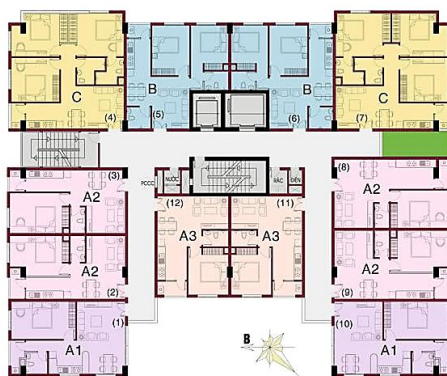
Typical high rise (1,545sqm, 772m², 49.9% built-up density, 19 floors, 7.54 ratio between total floor area and residential area, 156 housing units, H=50m, 566 people)
